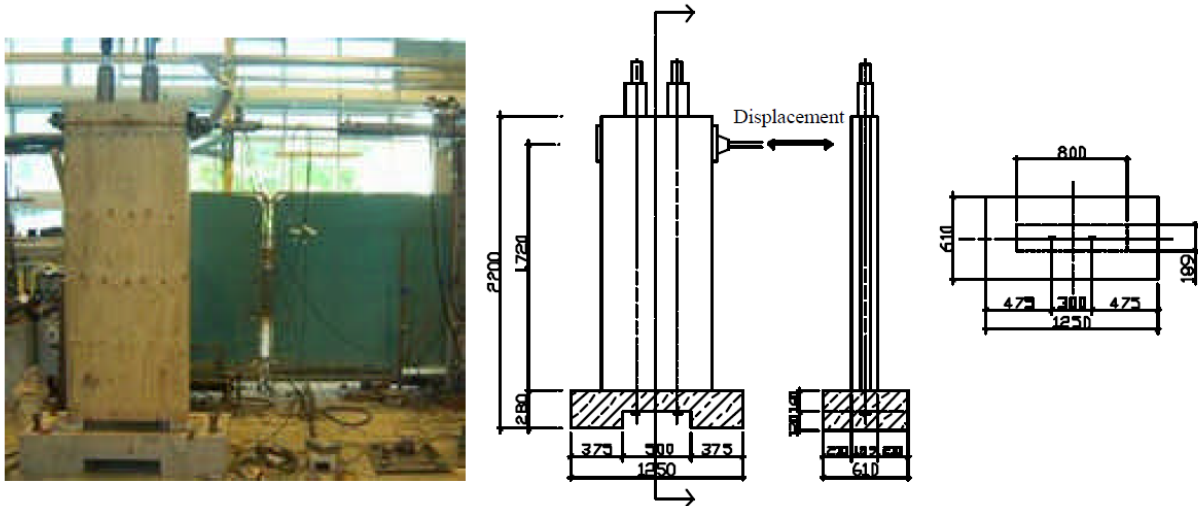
Test setup and geometry details for quasi-static cyclic tests on wall-to-foundation connections [Palermo et al., 2006]
